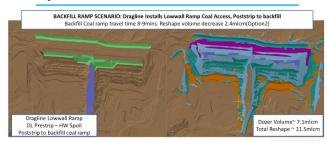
Backfill ramp scenario: dragline installs low wall ramps coal access, poststrip to backfill.
